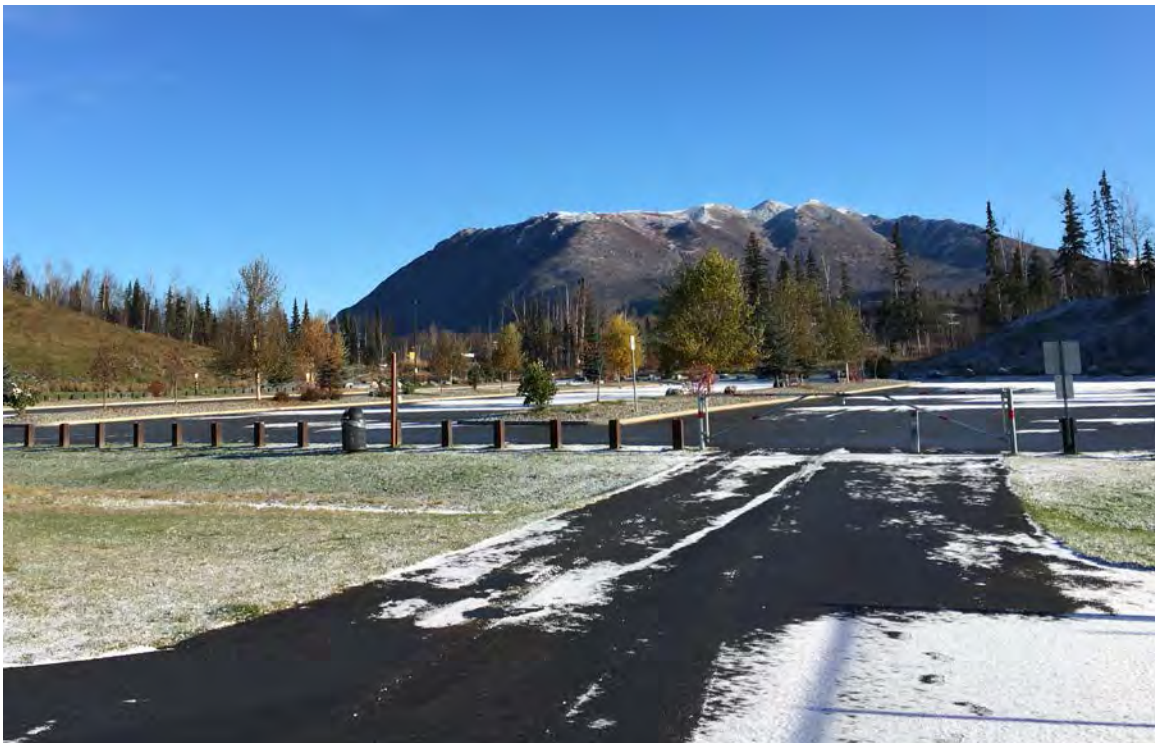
VIEW OF THE PARKING AREA, FACING EAST. PLAYGROUND IS TO THE NORTH.
